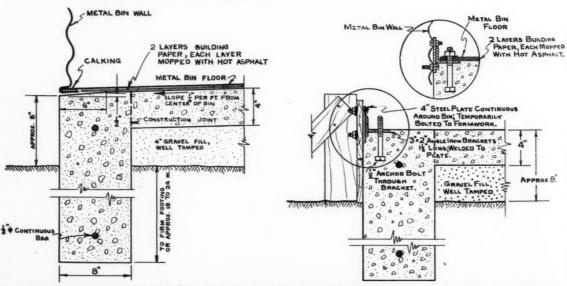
(Left) Suggested detail for concrete base for circular metal grain bin • Fig. 9 (Right) Suggested detail for improving wall anchorage for circular metal bins by casting anchorage plate and brackets into concrete bin base. Inset shows bin wall attached after formwork is removed
